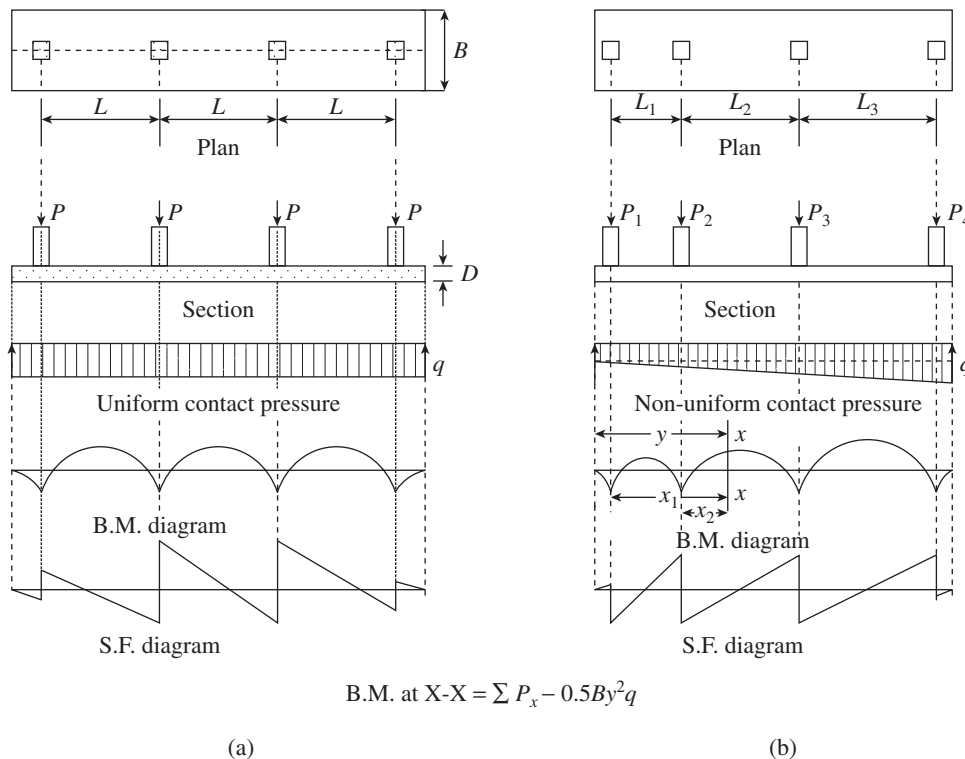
Strip column footing (a) With equal column spacings and loads (b) With unequal column spacings and loads
